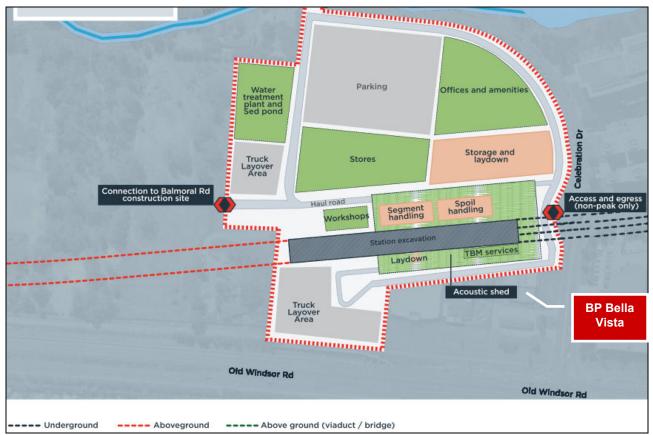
Proposed Bella Vista Station Layout and BP Site
